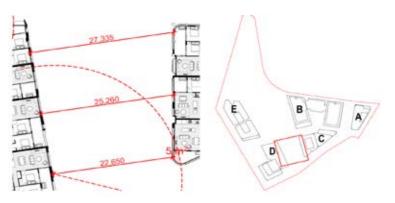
F1.8 Building D-C non compliant separation (Level 08 Only) & Key Plan
